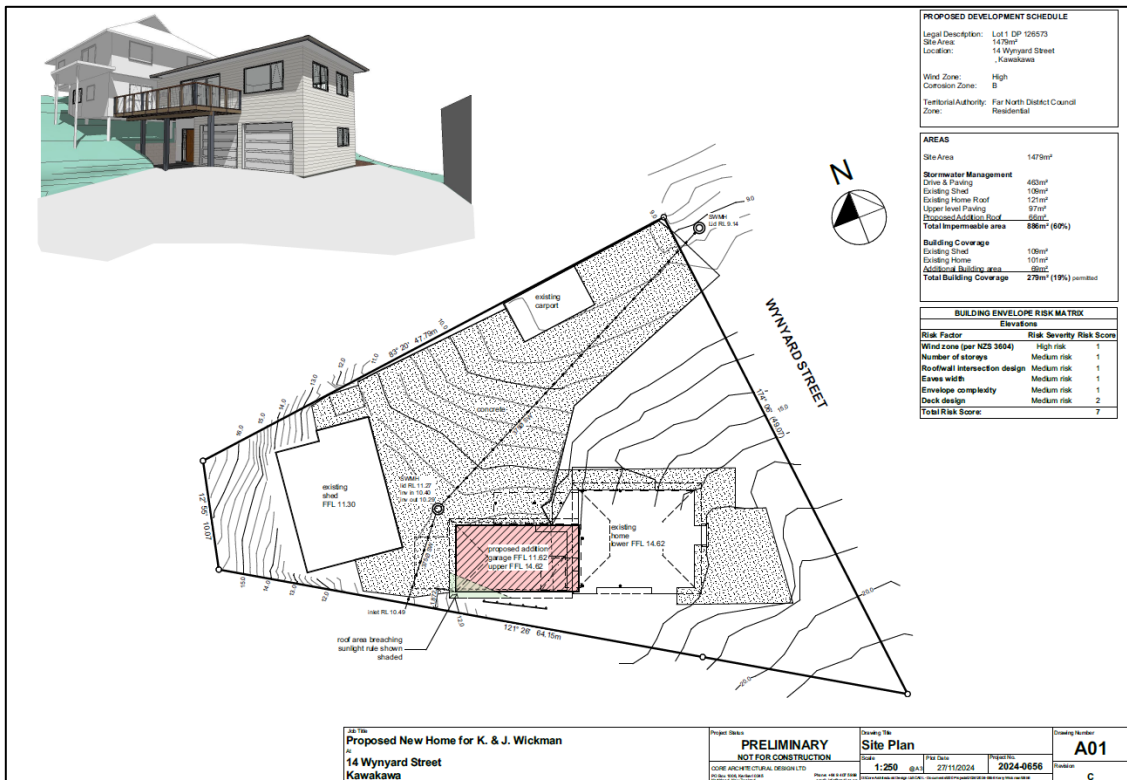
Snip of Proposed Site Plan Provided by Core Architectural Design Ltd (Ref No: 2024-0656 Rev C, dated: 27.11.2024)
